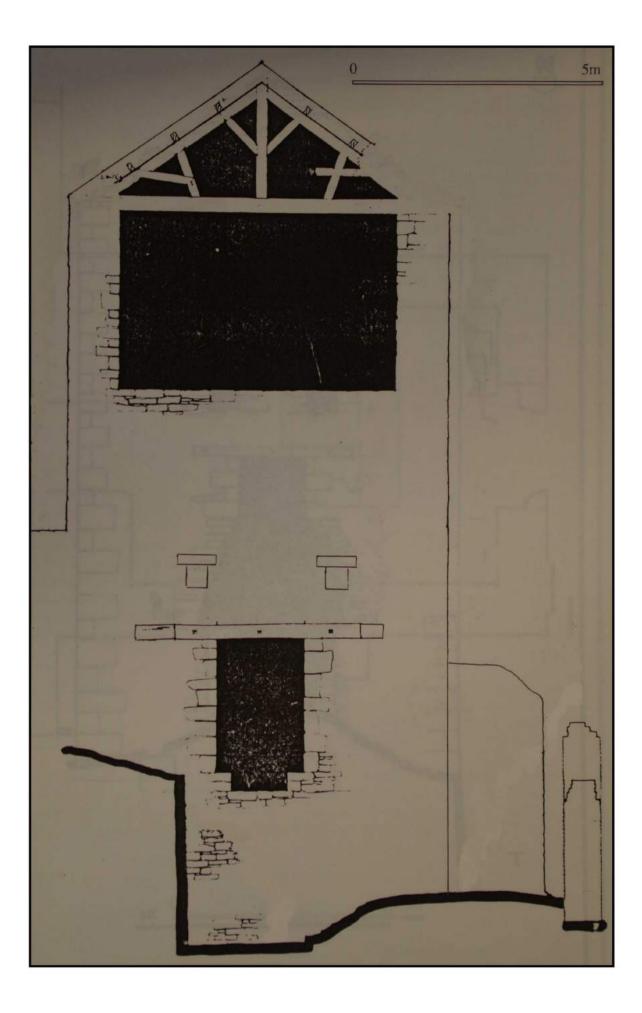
Cornish engine house; west elevation, Snailbeach, after Morriss 1997
